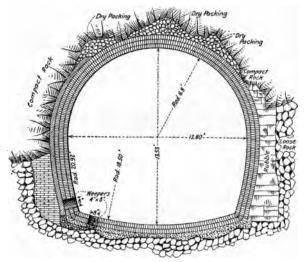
New Croton Aqueduct (Gravity-tunnel).
